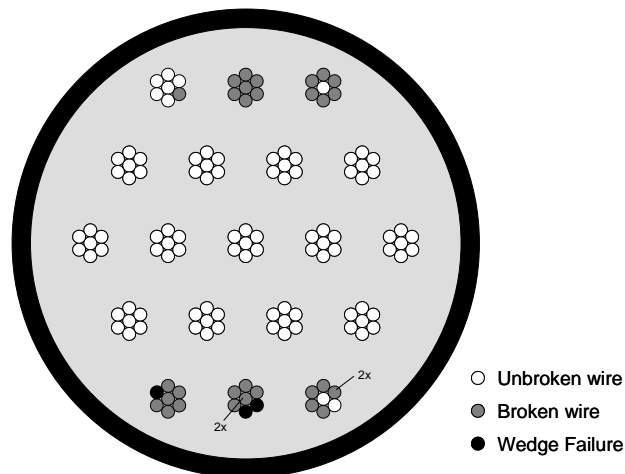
Corrosion of Wedges at Tower End – Specimen 12
